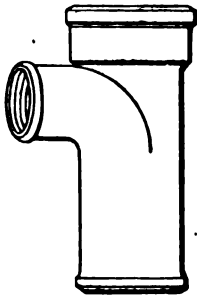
Cast Soil-Pipe with Threaded Branch to Connect to Wrought Pipe.
